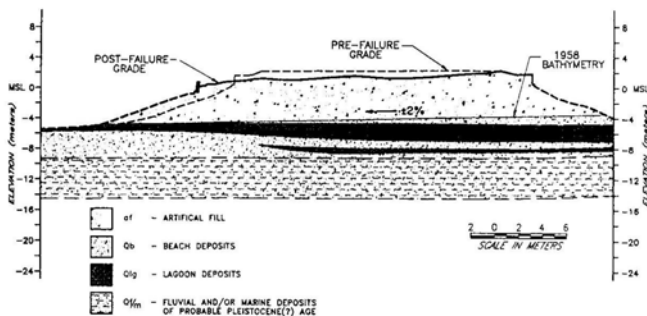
Cross-section of the initial and deformed embankment, after the liquefaction failure of the mole at King Harbor during the Northridge Earthquake of January 17, 1994 (Kerwin and Stone, 1997).
